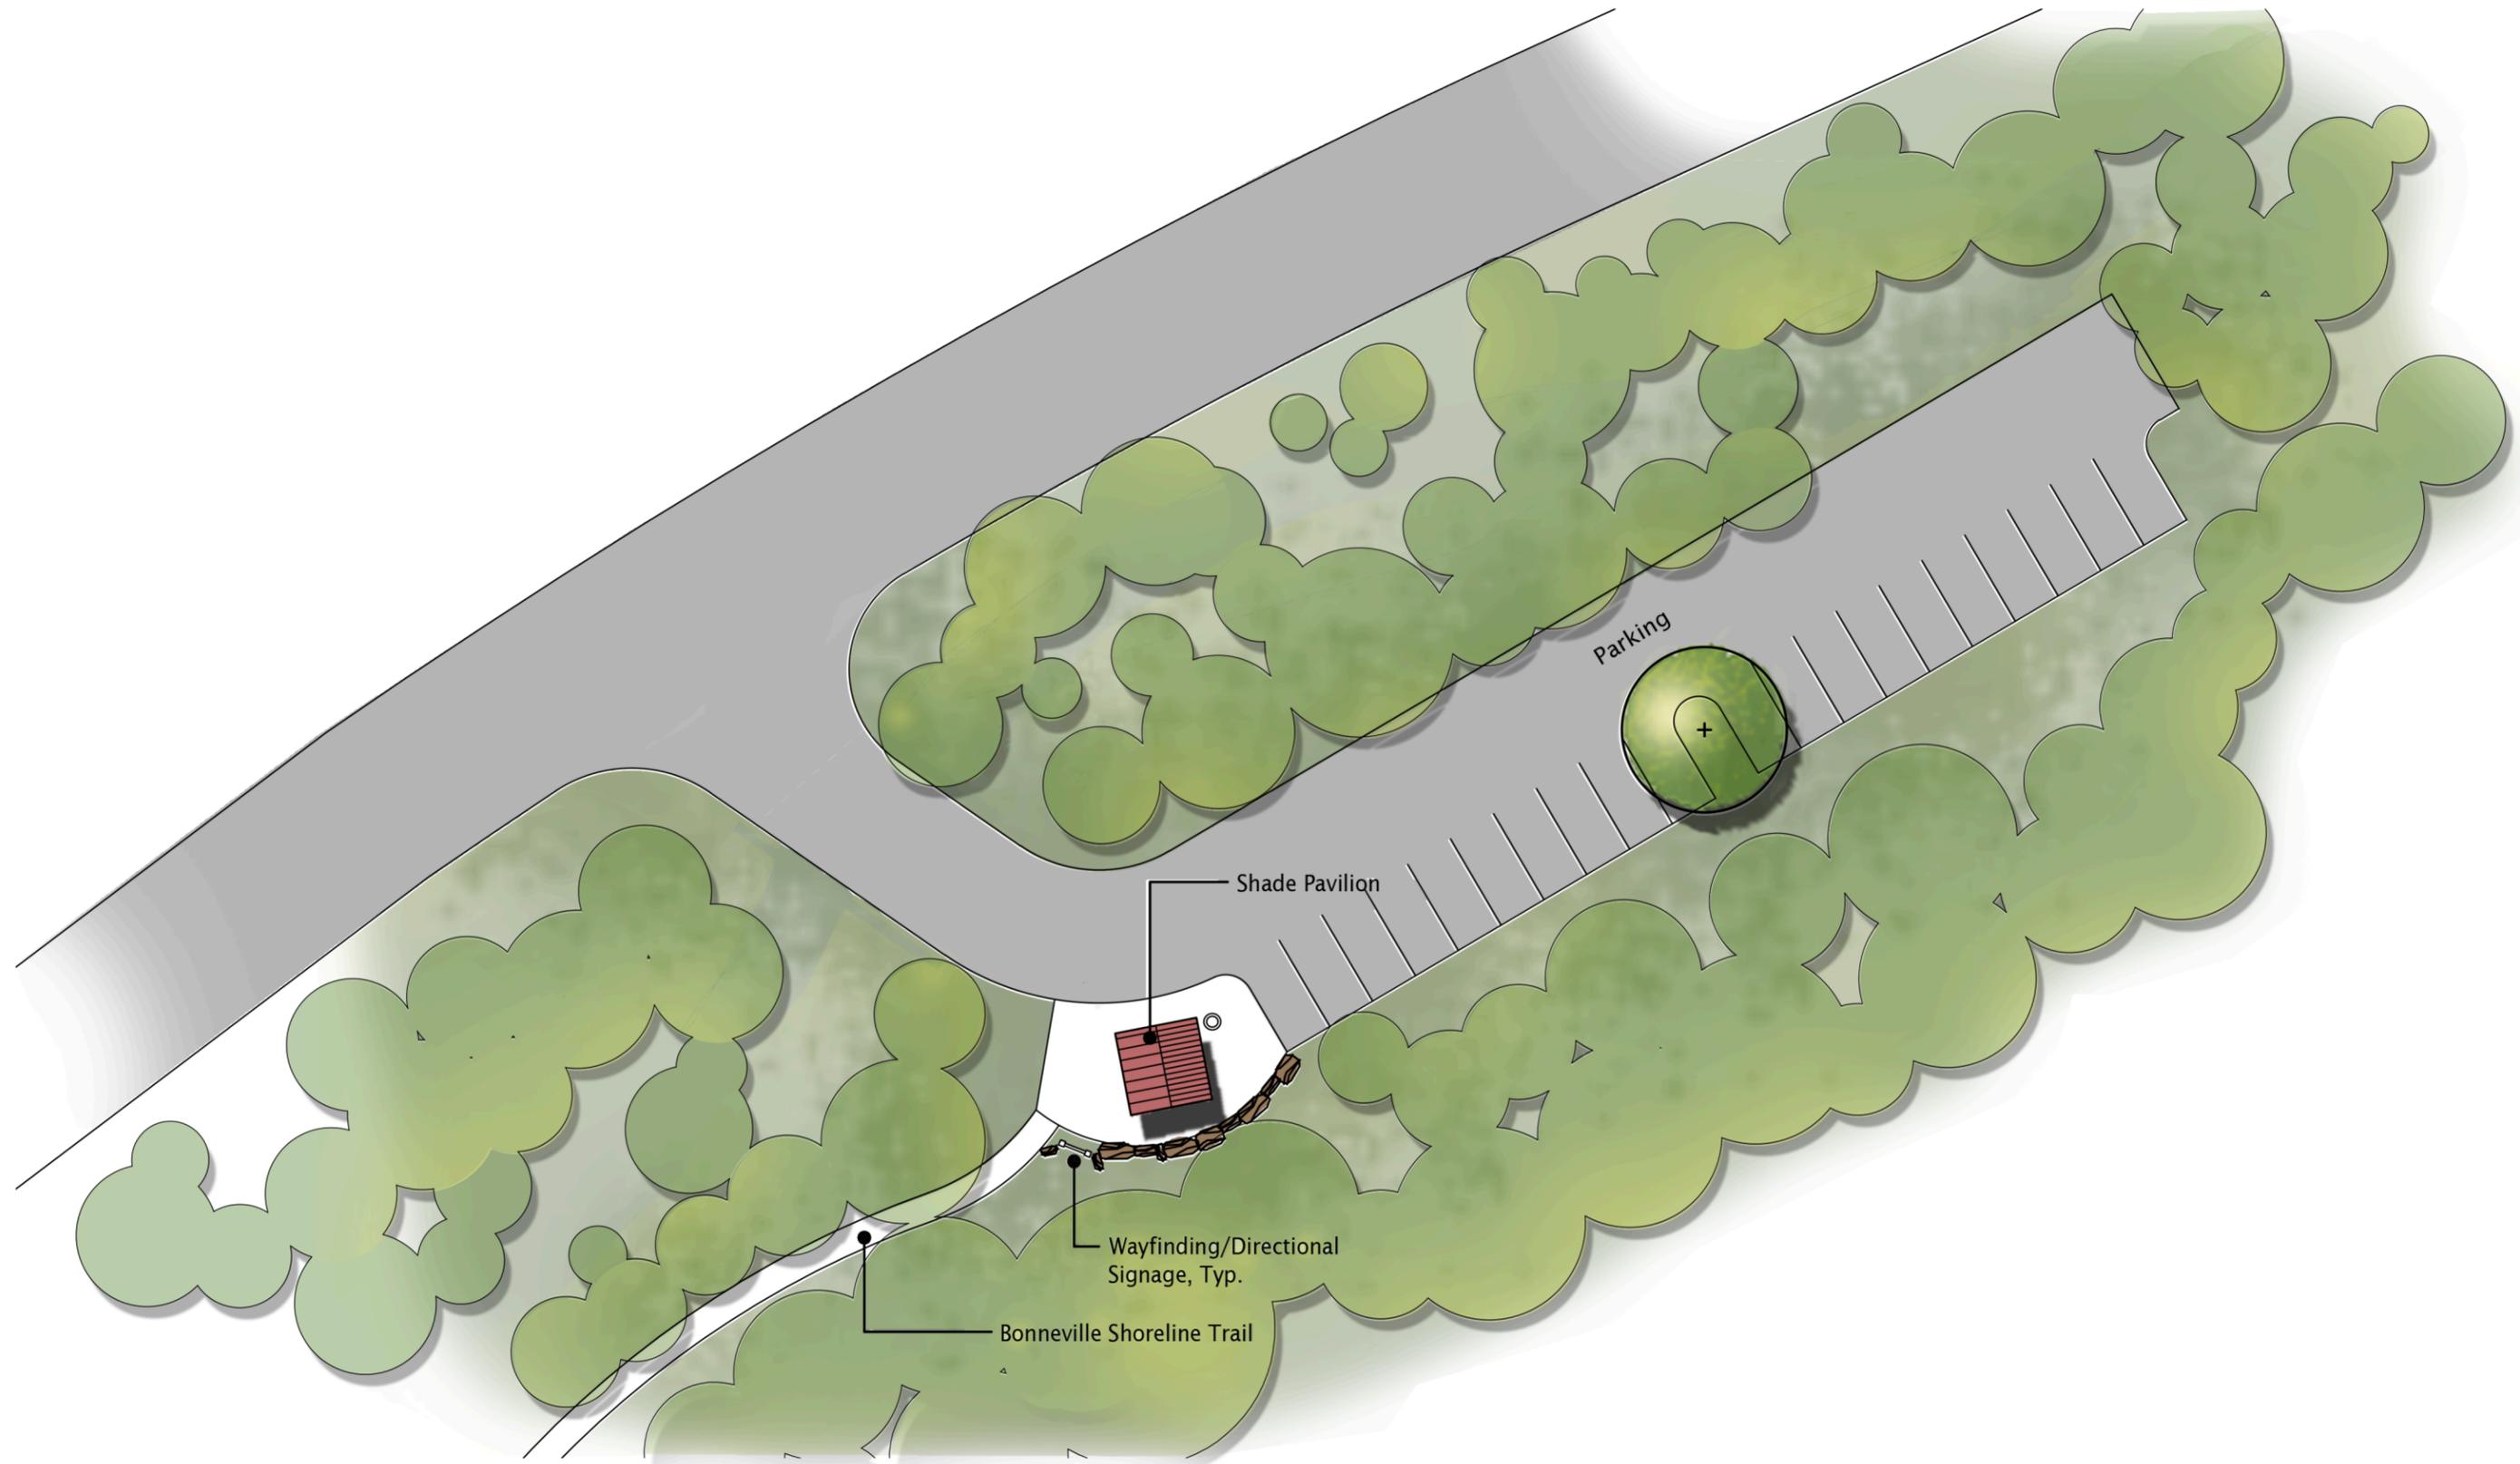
SECONDARY ACCESS TRAILHEAD TYPICAL
